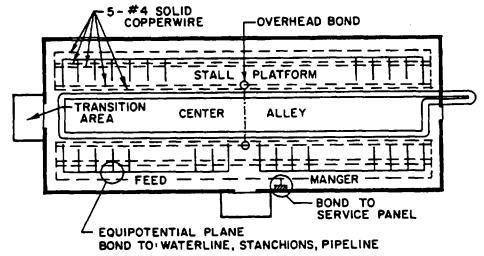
Retrofit equipotential plane in stanchion/tie stall barn.
